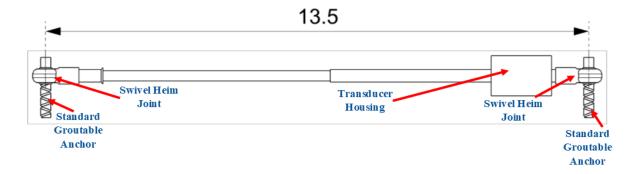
, Drawing, Detail of Crackmeter for Outboard EDTs
